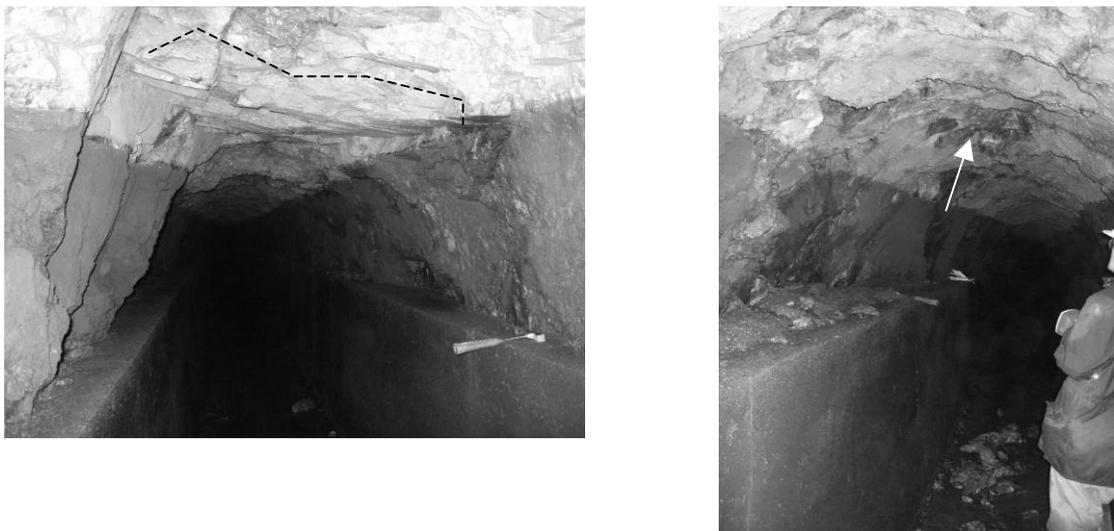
Kaitoke Tunnels showing sections of rock block separation (a) low angle 0.3m thick separated slab crossing roof (dashed line) and (b) site of minor slabbing at the roof (arrowed) with debris on floor
